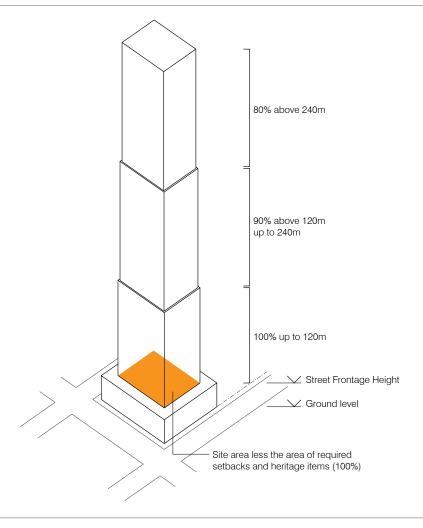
Maximum Building Envelope Are above Street Frontage Height
